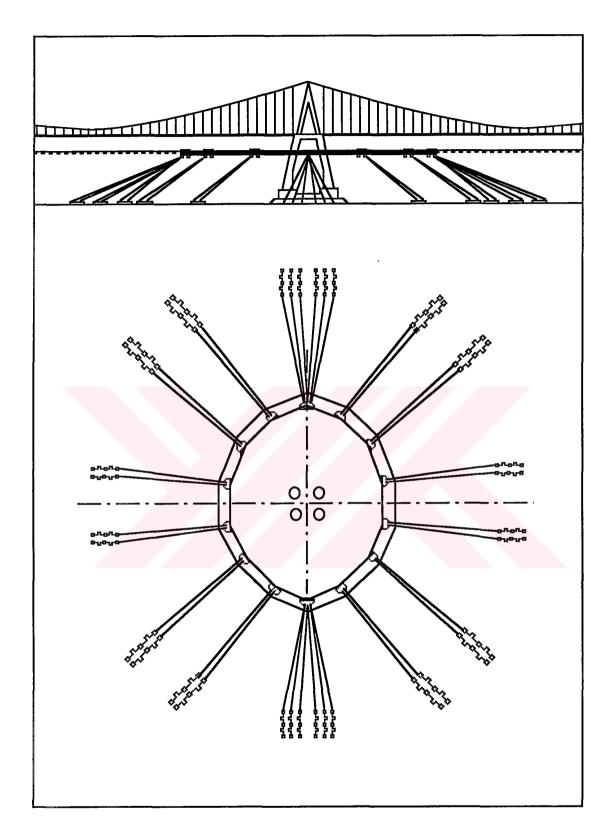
PROPOSED CABLE NET SYSTEM FOR THE GIBRALTAR BRIDGE
